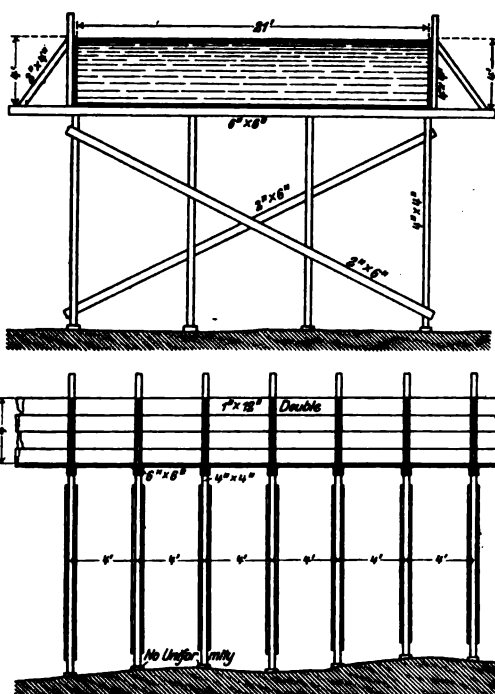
Details of the Beaumont Irrigation Co's Canal, Tex.
